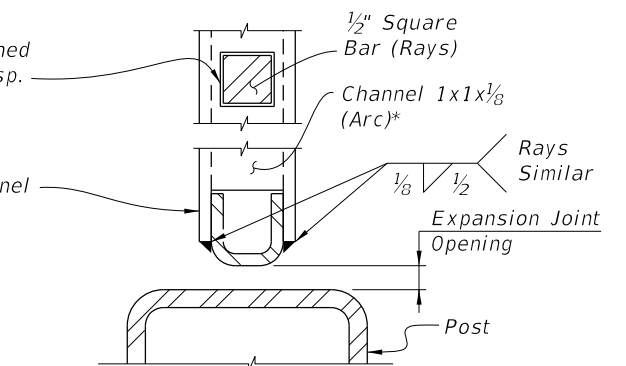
A" INTERMEDIATE RAIL/RAY CONNECTION
